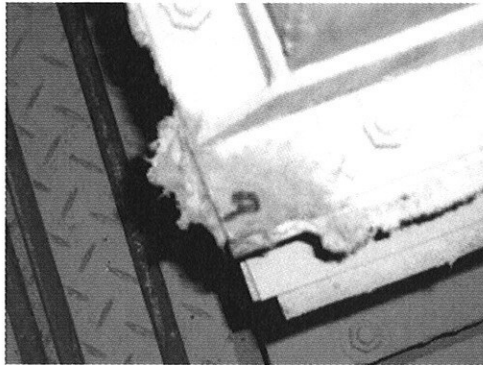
Fibrous cloth, Between flanges of the ducting sections located next to the air blowers (Sample No. B/261/06/9)
